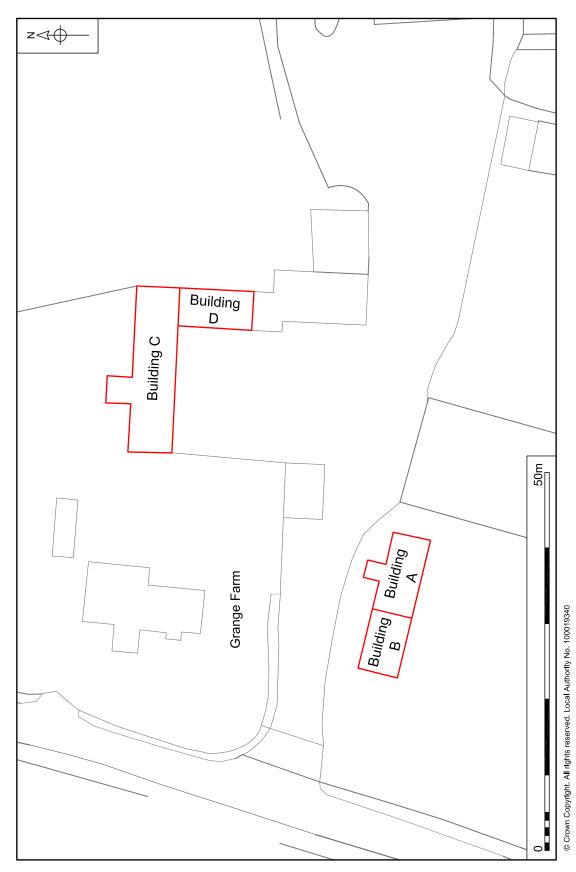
Plan showing location of Buildings A - D. Scale 1:500
